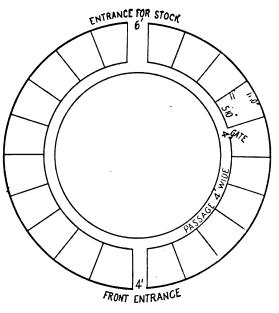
A CATTLE SALE BARN (FLOOR PLAN).
